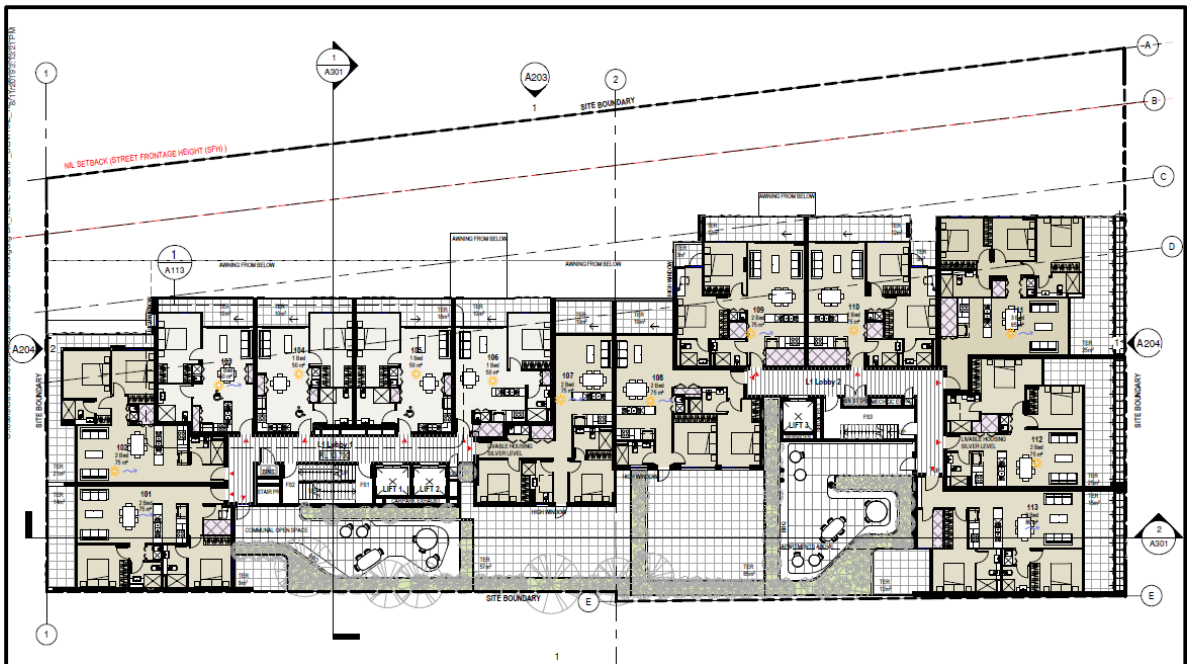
Proposed First Floor Plan (*Source: Brewster Murray)
